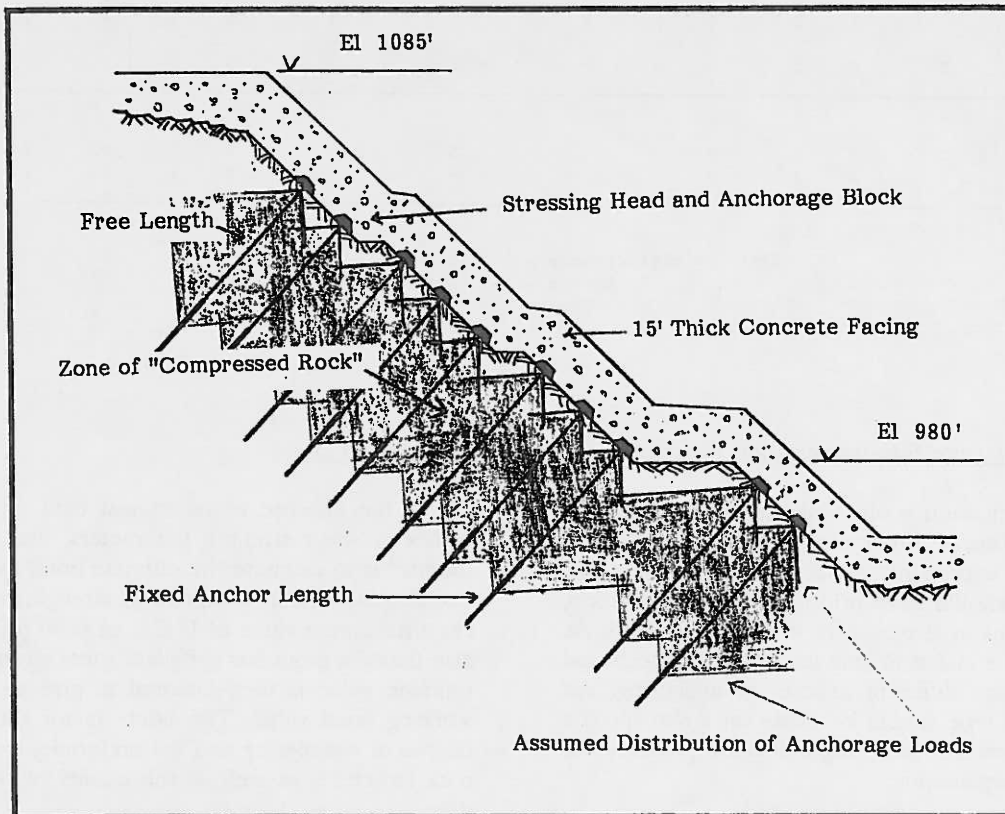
Anchors for slope stability and rock reinforcement, Service Spillway Plunge Pool, Tarbela Dam, Pakistan (idealized section).
